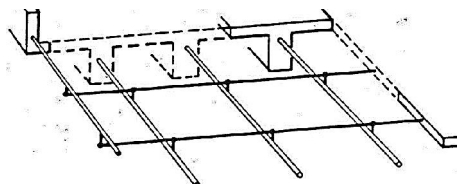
B. b- longitudinal grillage for main girders and lumped transversal grillages for the slab spaced at 1 met.
